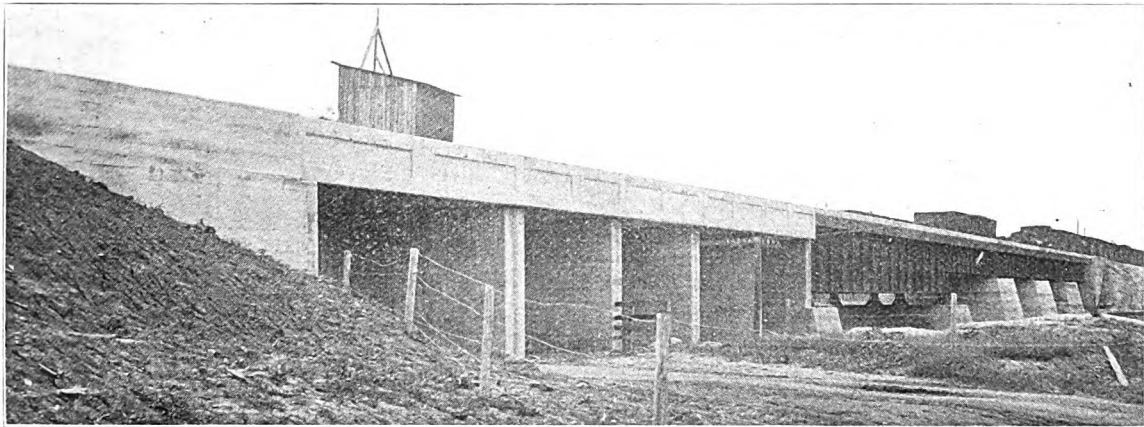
Concrete Trestle and Deck Plate Girders, with Concrete Slab Floors, C., M. & St. P. Ry.
